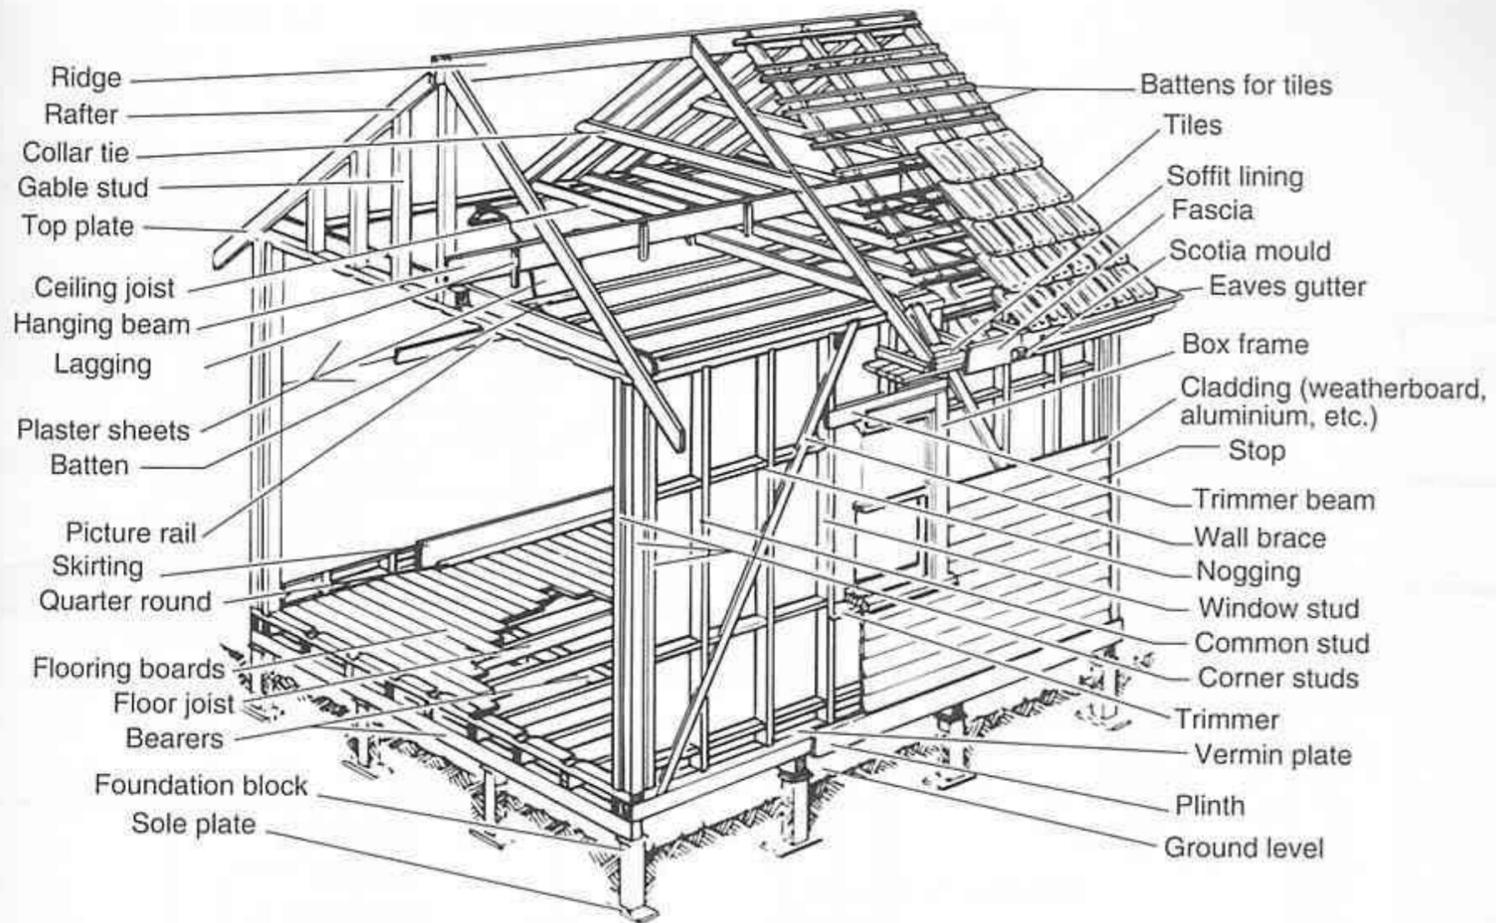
Timber construction: external cladding, gable-tiled roof WORKCOVER AUTHORITY OF NSW
